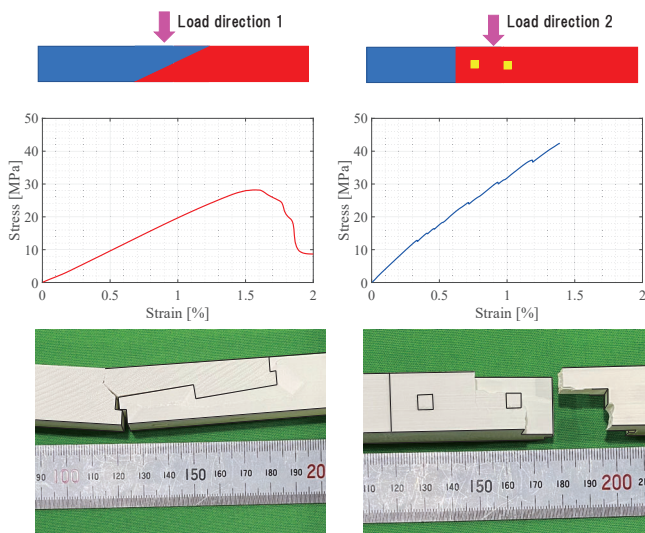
The result of 3-point bending test of "Okkakedaisentsugi" : (top) load direction, (middle) stress-strain diagram, (bottom) view of fractured area : Black lines show the outline of the joint shape before fracture.
